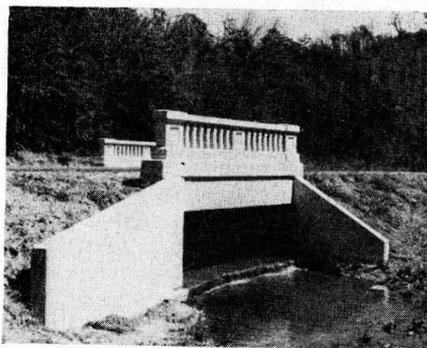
Reinforced Concrete. Courtesy of Portland Cement Assn.
